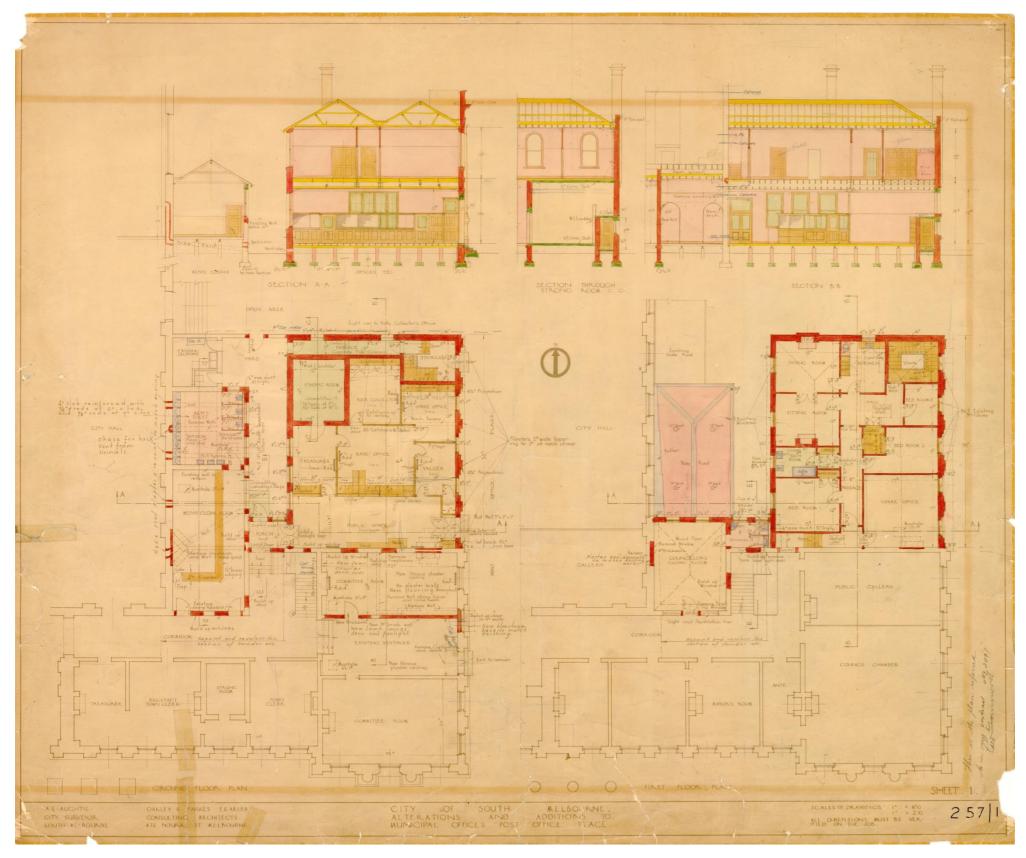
c. 1938 plan by Oakley & Parkes detailing the reconstruction of the former Postmaster's Residence and yard as improved municipal offices (ground) and a hall keeper's flat (first floor) Source: City of Port Phillip
